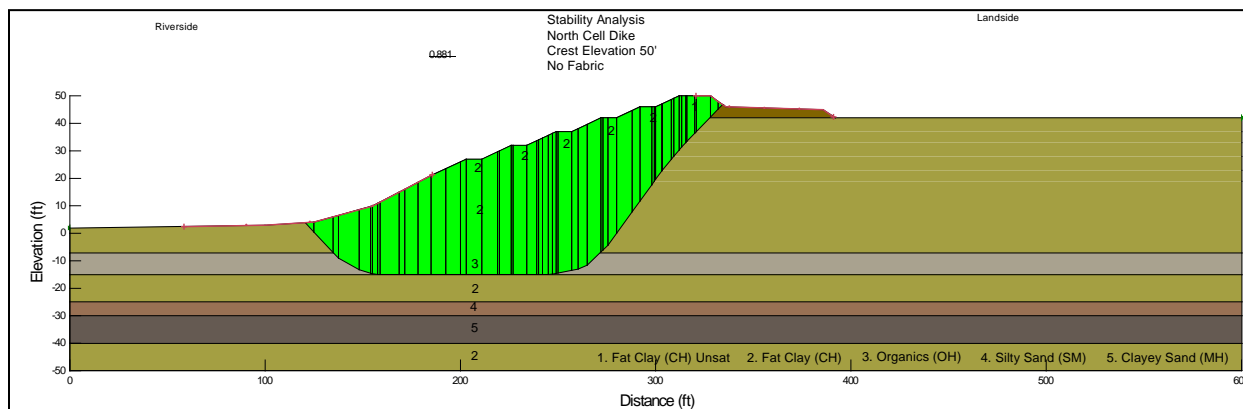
North Cell. Elevation 50'. No Geotextile. FS = 0.881.
